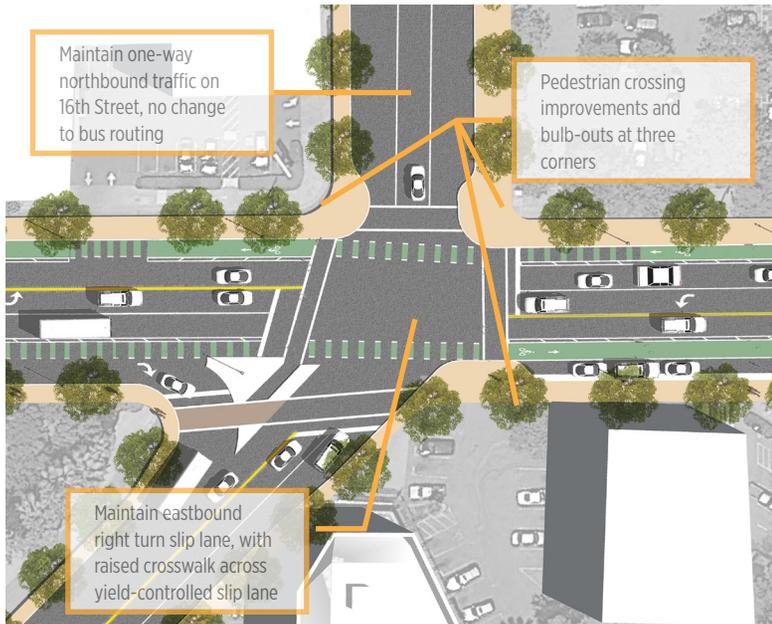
LAND PARK DRIVE/ 16TH STREET OPTION 1 BIRD'S EYE RENDERING
